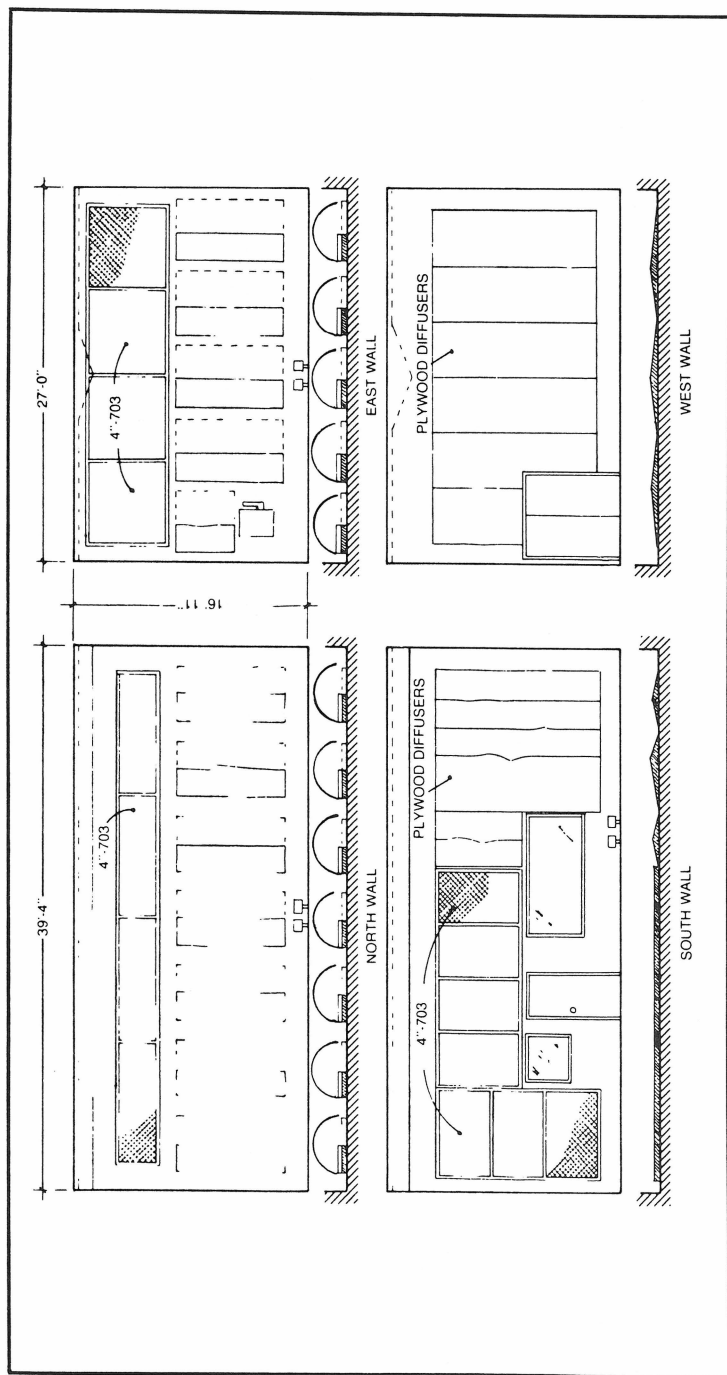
Wall elevations showing treatment plan in large Studio A. Swinging panels on the north and east walls allow considerable range in adjustment of acoustics, supplementing plywood diffusers/absorbers and wideband elements.
